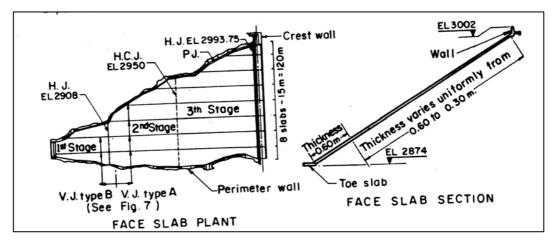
Face slab layout of Golillas Dam (Marulanda and Amaya, 1985)
